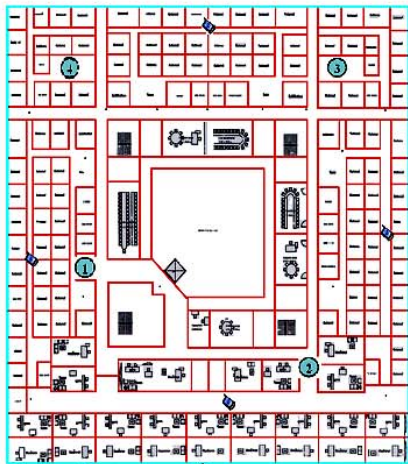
Layout of 4<sup>th</sup> level at C-building.
